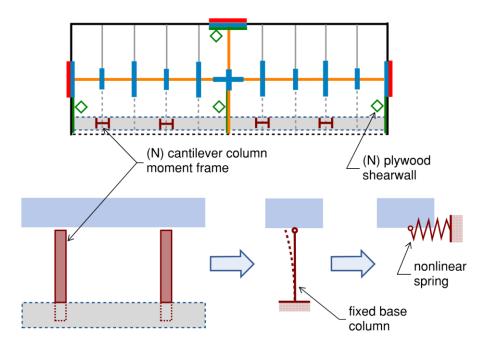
The first-story elements of the FEMA P-807 retrofit for a long-side-open archetype. The cantilever column moment frames at the open front are idealized as fixed-base columns and nonlinear springs.
